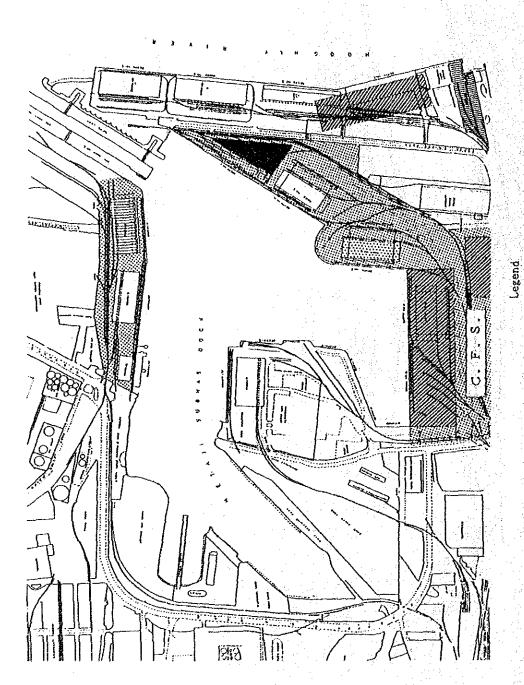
Pavement at K.P. Dock in 2005
